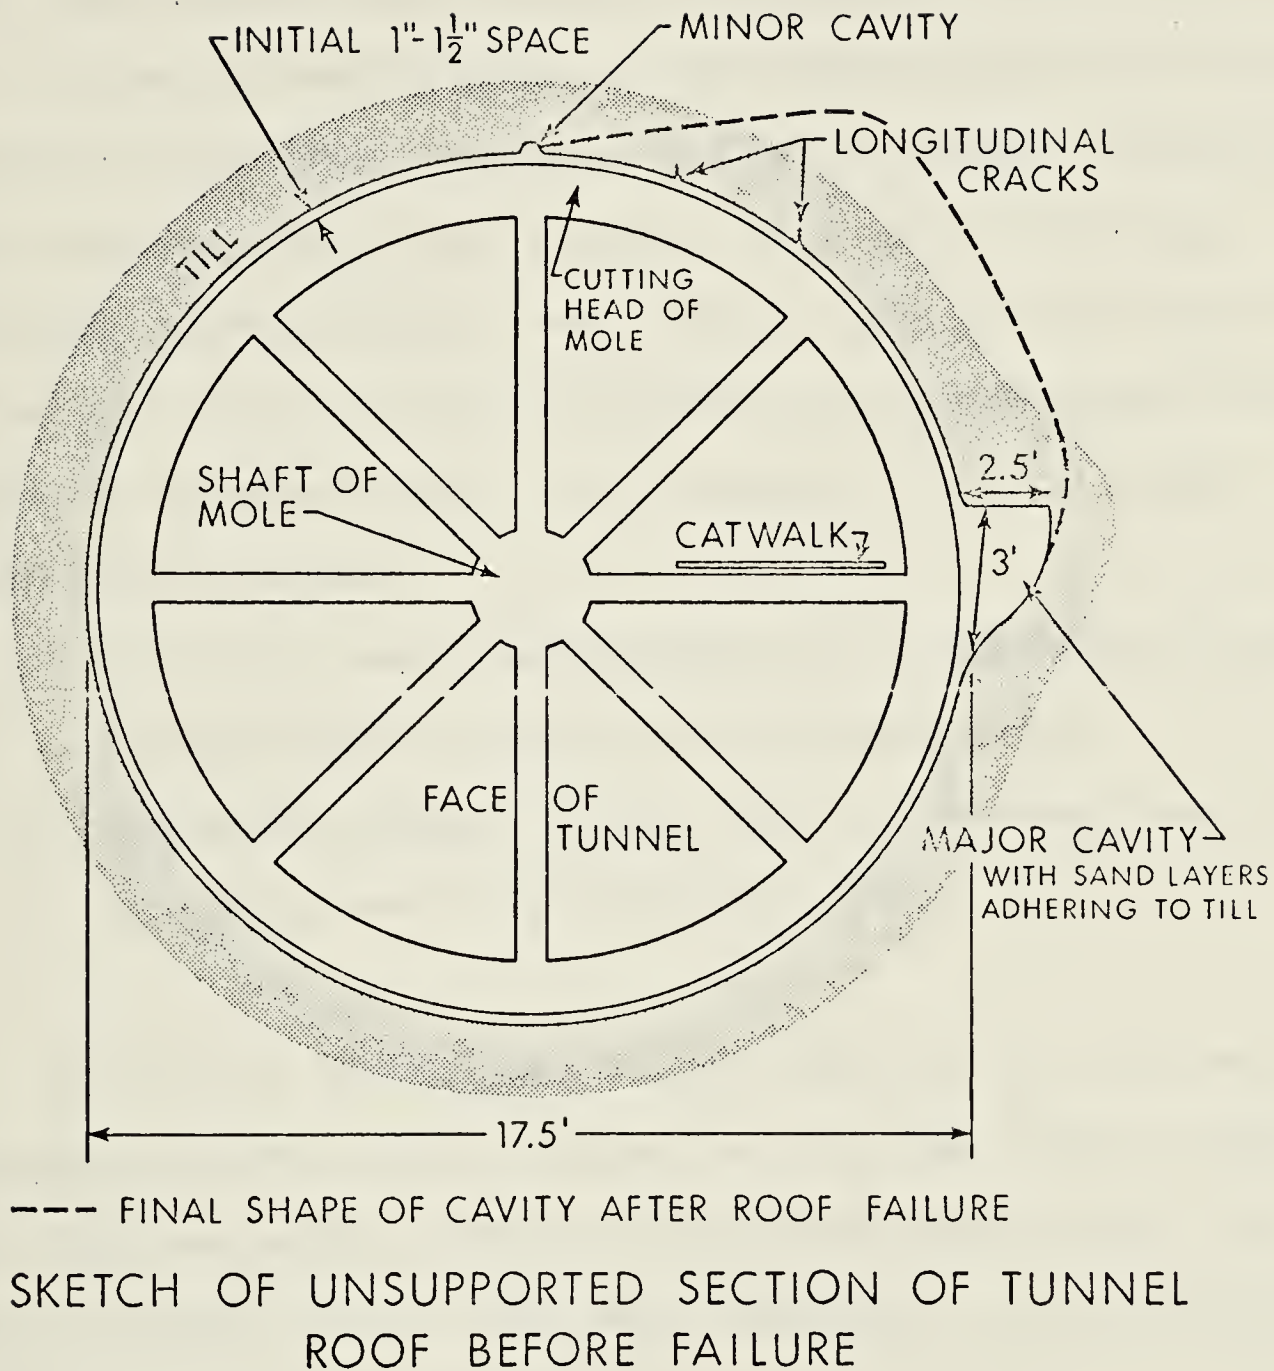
Failure zone of unsupported section of tunnel roof (after Matheson, 1970)
